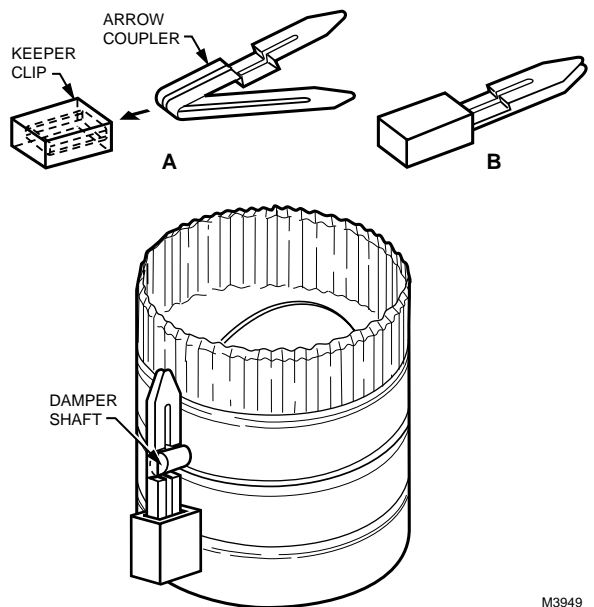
Installing arrow coupler on damper shaft using keeper clip.
